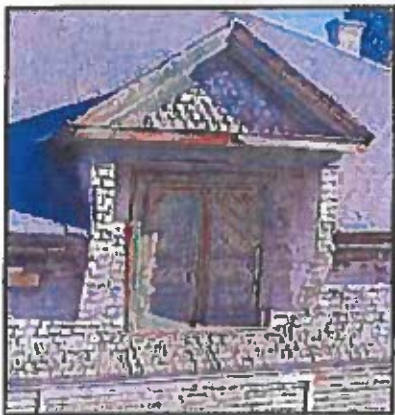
West facade dormer with original loft doors still in place. The doors should be retained and preserved as a significant historic feature. The trim on the dormer is extensively weathered needs to be replaced.
